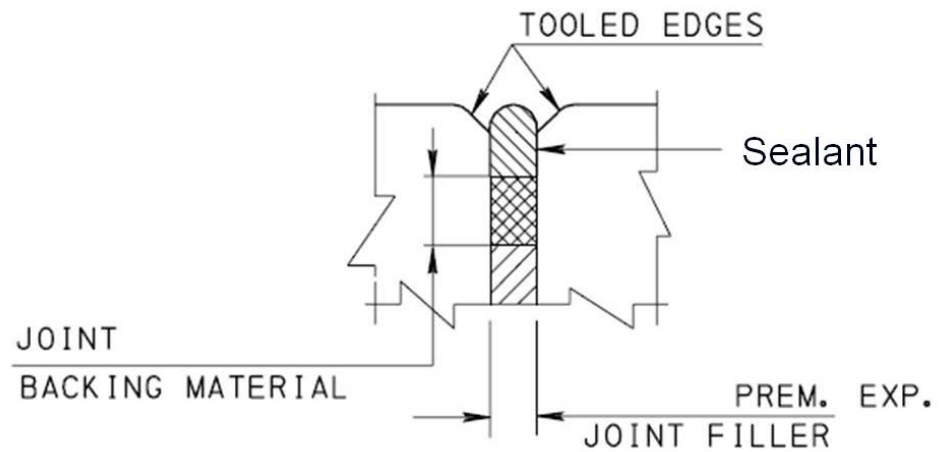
Cross Section of a Pourable Joint Seal
